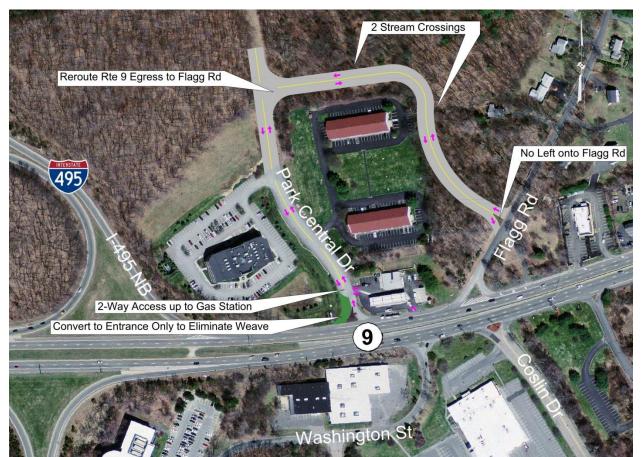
Route 9 Improvements at Park Central Drive to Flagg Road Egress Modification
